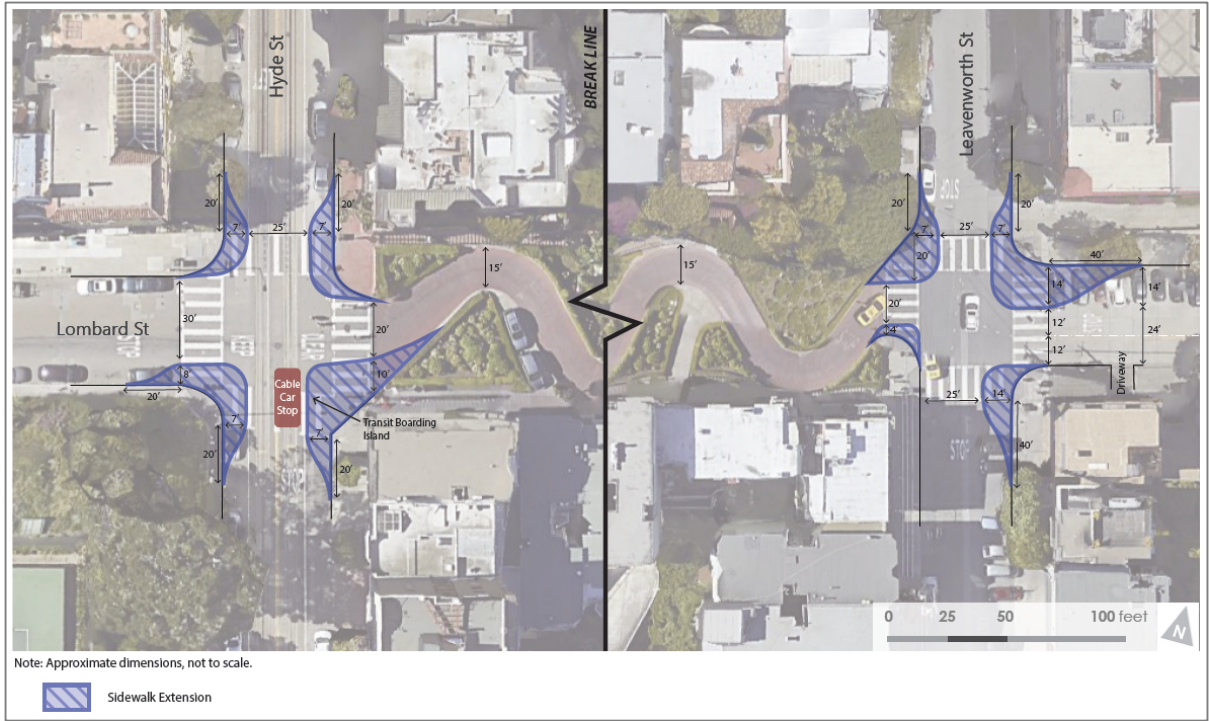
Conceptual Design 1 for Sidewalk Extensions (see appendix for full-size drawing)
